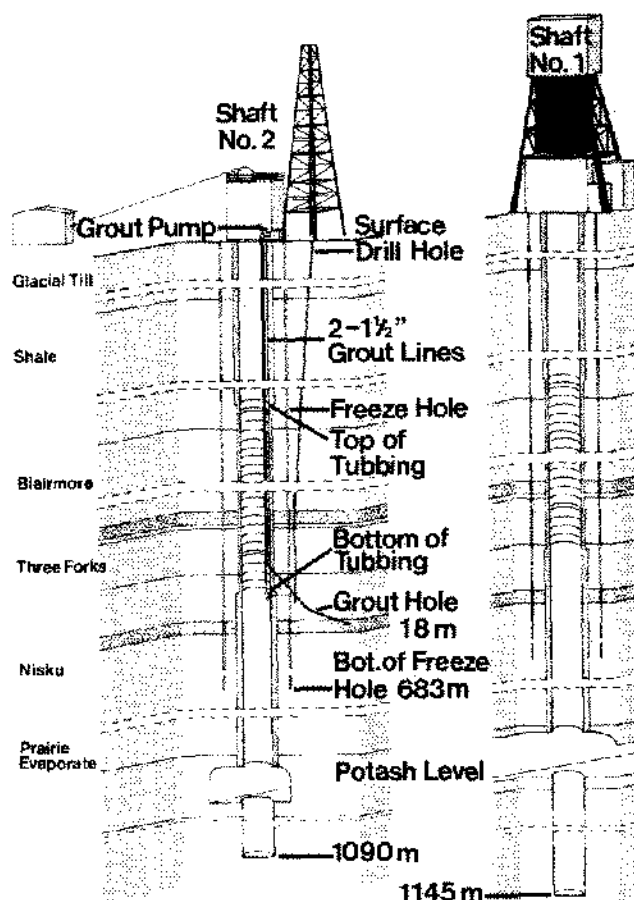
Shafts No. 1 and 2 and surface drill hole.
